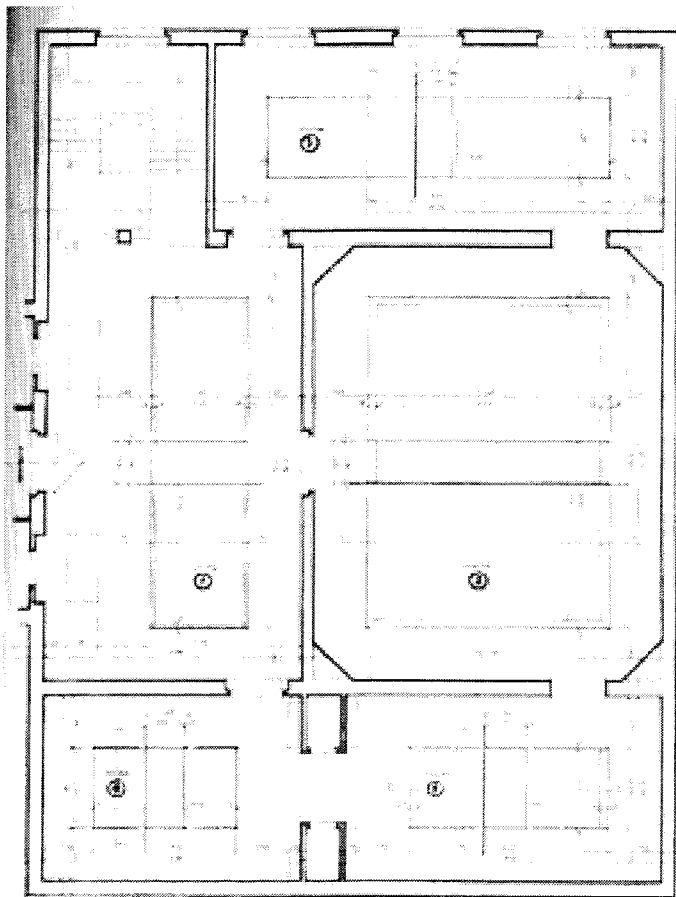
Floor plan Kunsthalle, Bern¹⁰
